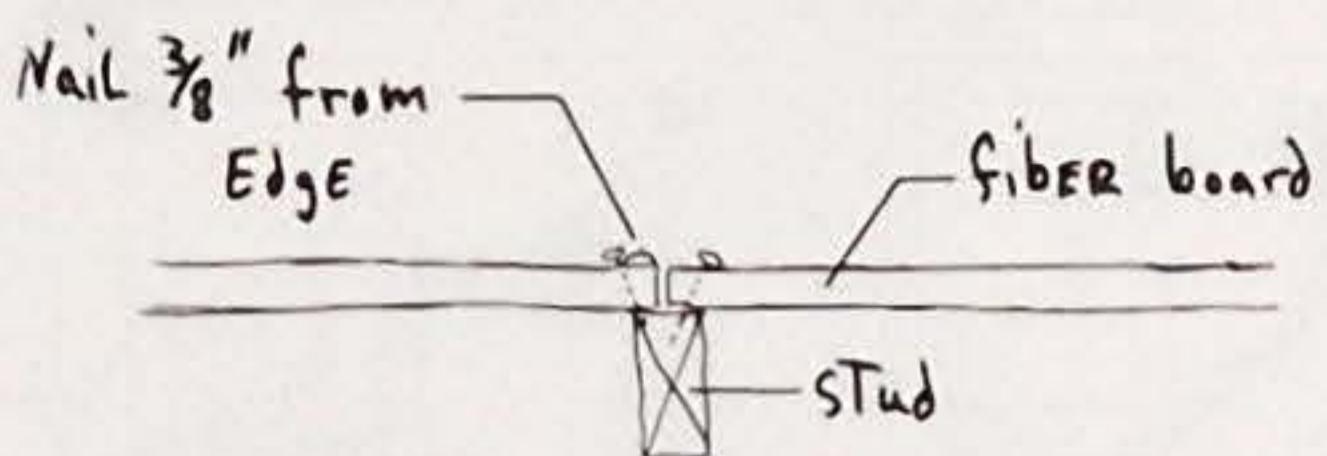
Nailing Fiber board To STUD (crossSection)
